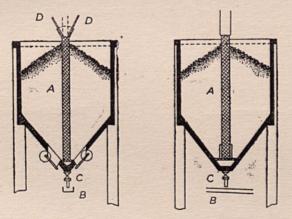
DRAINAGE COLUMNS IN BUNKERS.
